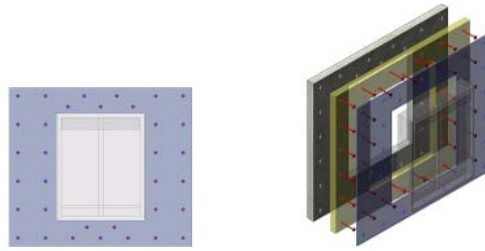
The facade system comprises a load bearing wall, thermal insulation, glass-fibre reinforced plastic (GFRP) anchors and a ultra high performance concrete (UHPC) façade panel.
